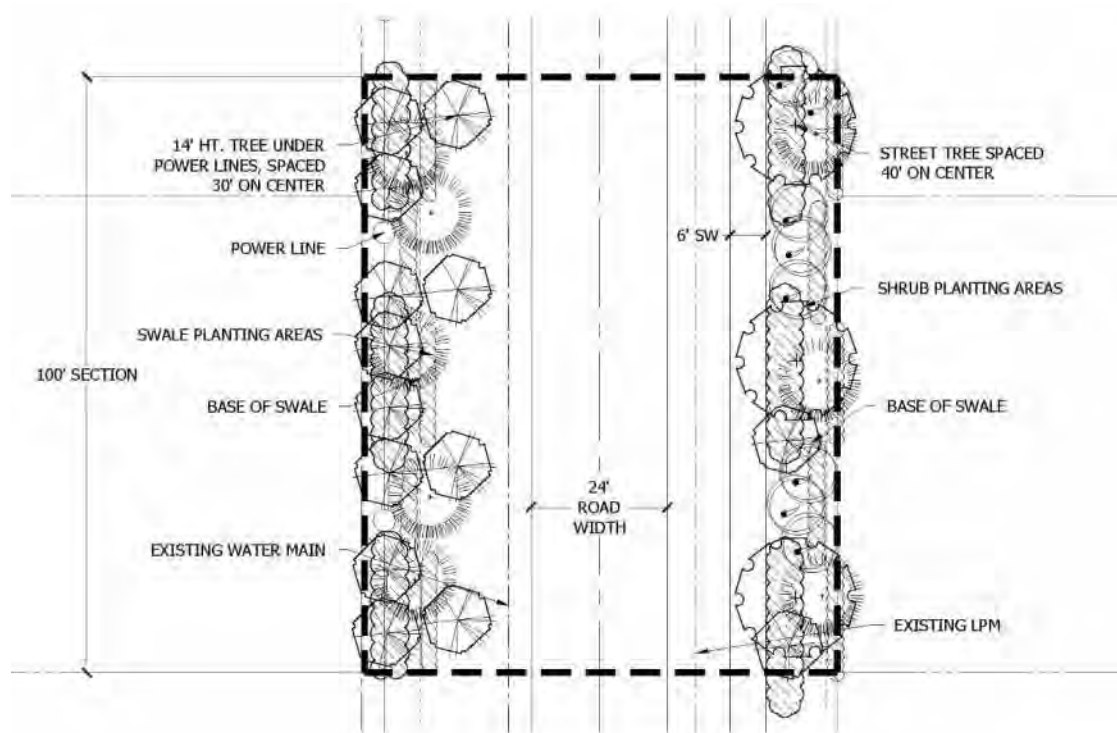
Typical 100-foot Plan View Section of Enhanced 80-foot Right-Of-Way
